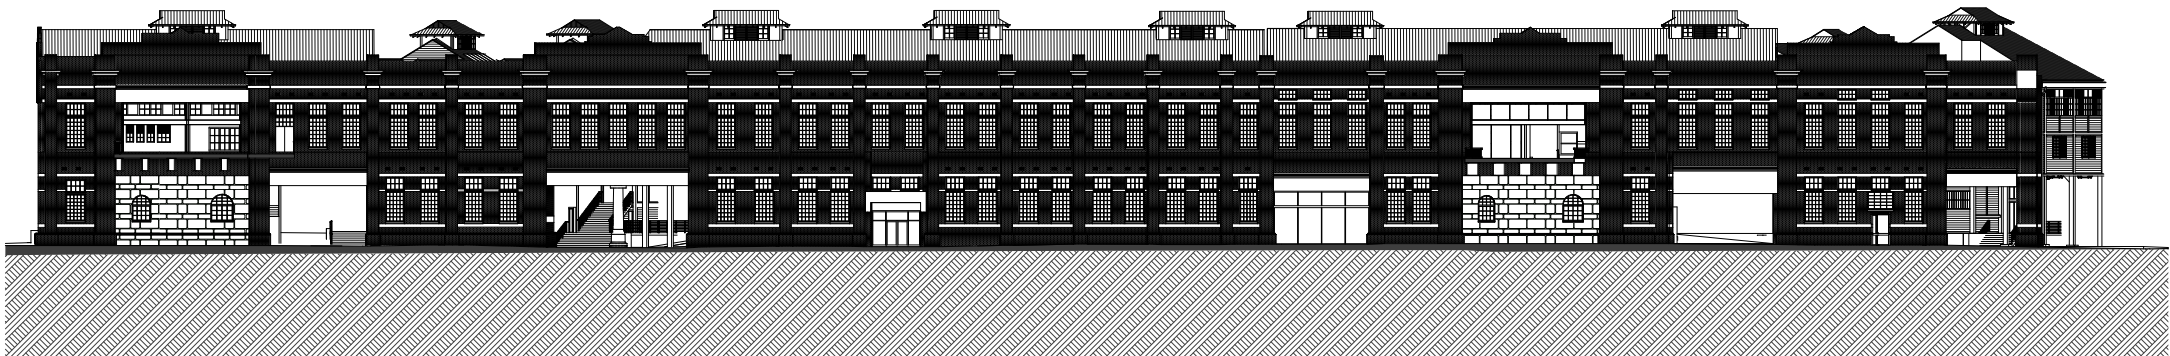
Existing Hickson Road south elevation Shore Sheds.
